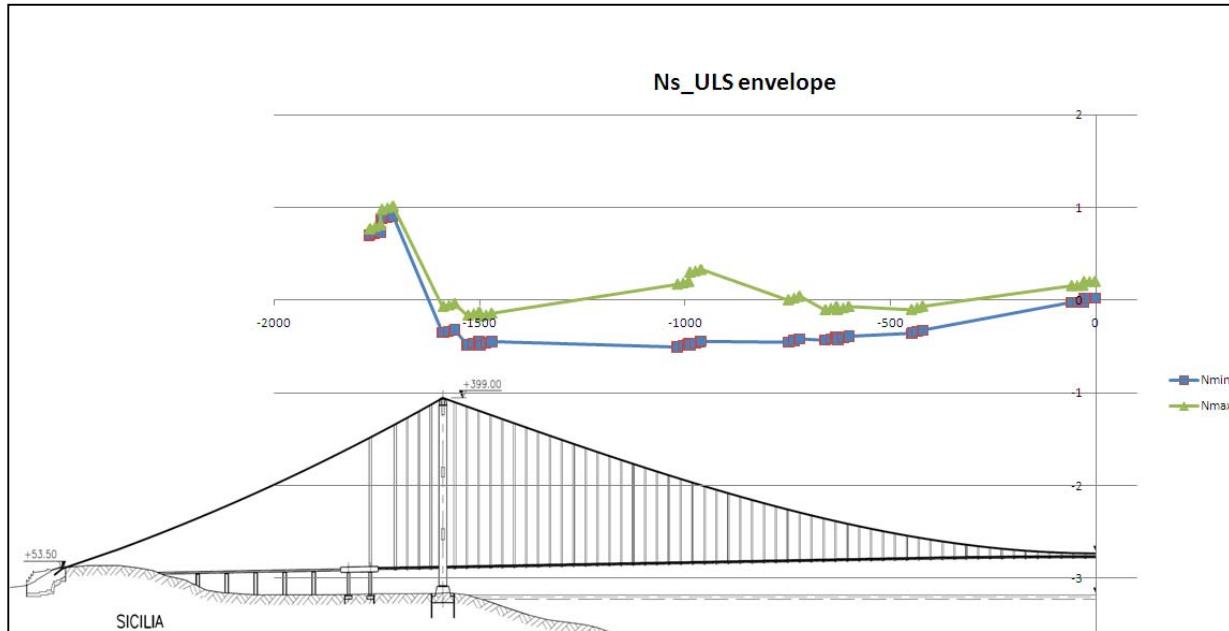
Sectional forces in road girder for rupture of hanger 30, Normal force (MN)
